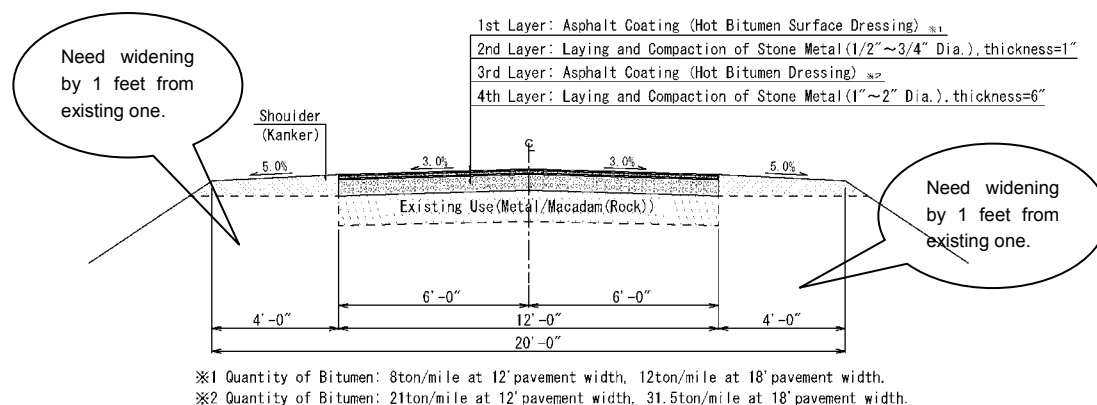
Typical Cross Section of Asphalt Pavement (Rural Road)
